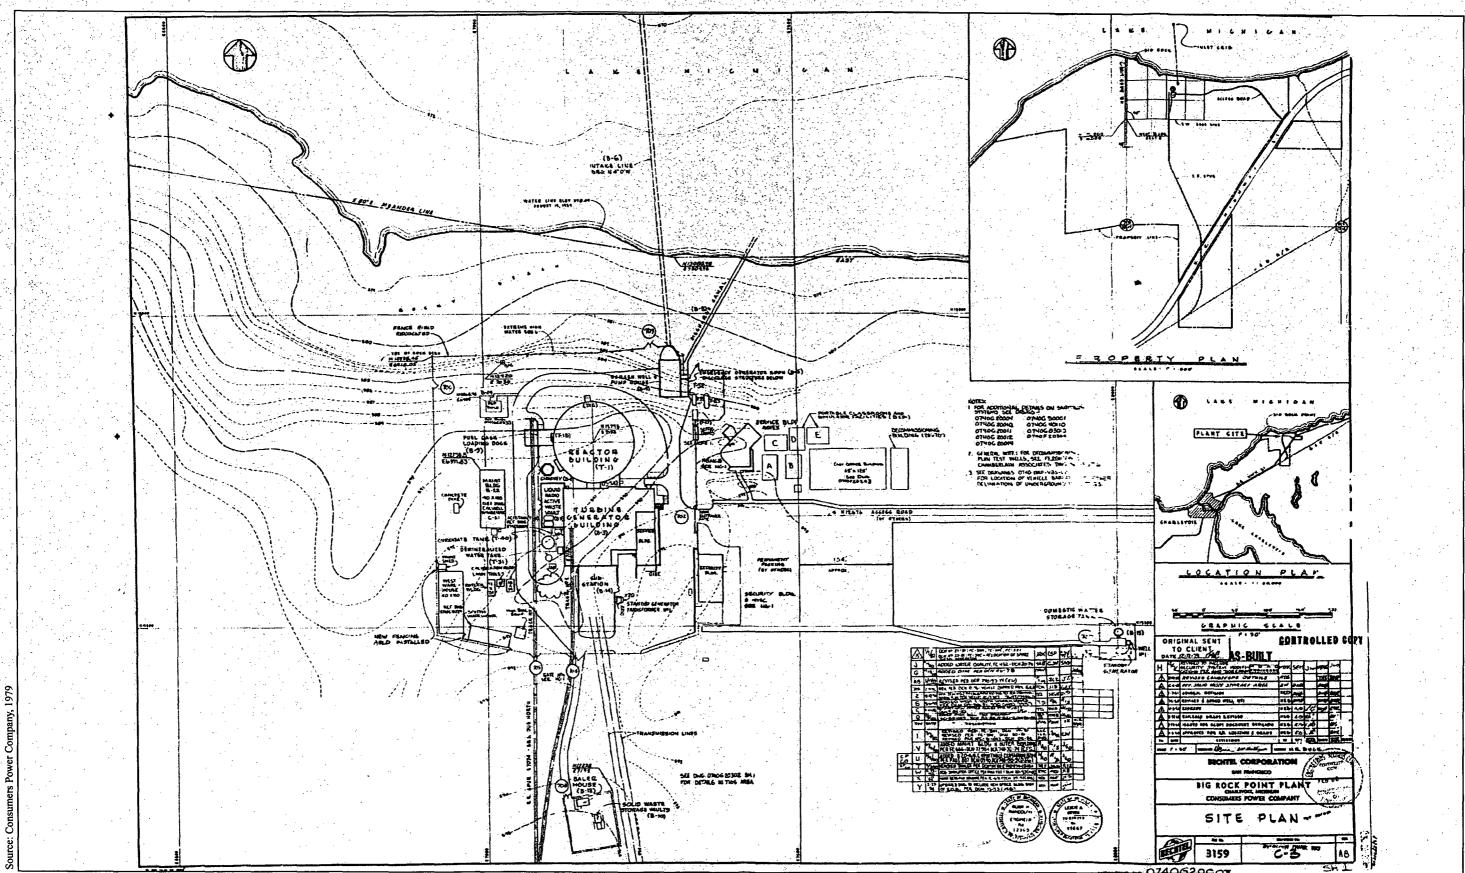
Big Rock Point Nuclear Power Plant Site Plan
